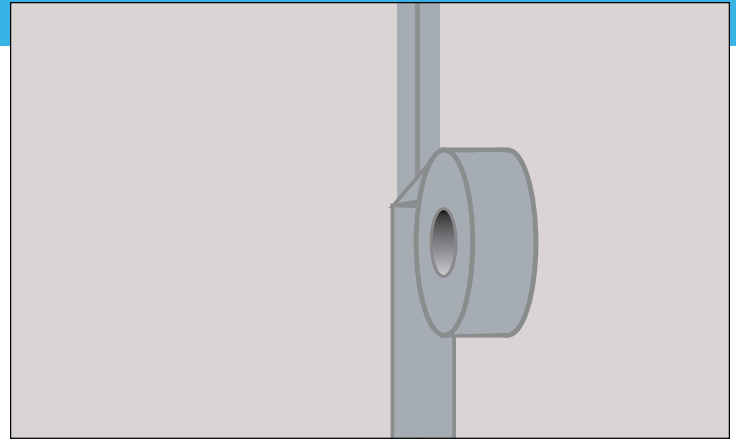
3/4" QuietRF® Shielding Tape application to seams
